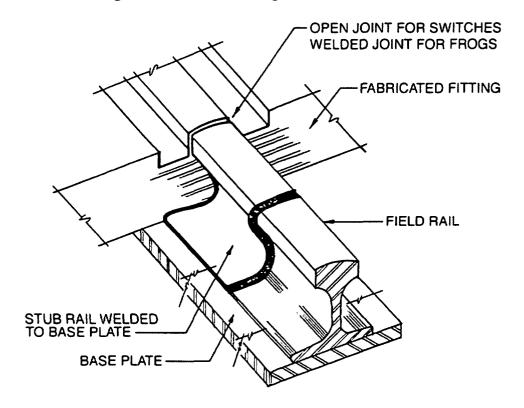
Fabricated Fitting with Welded Stub Rail.
